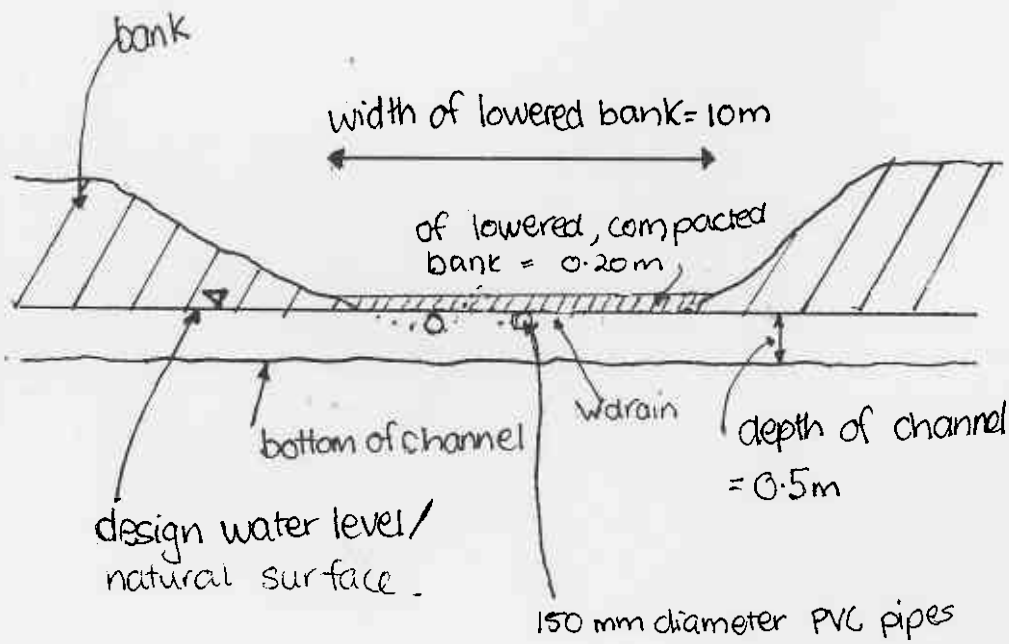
DETAIL - DRAIN SEGMENT 3B
